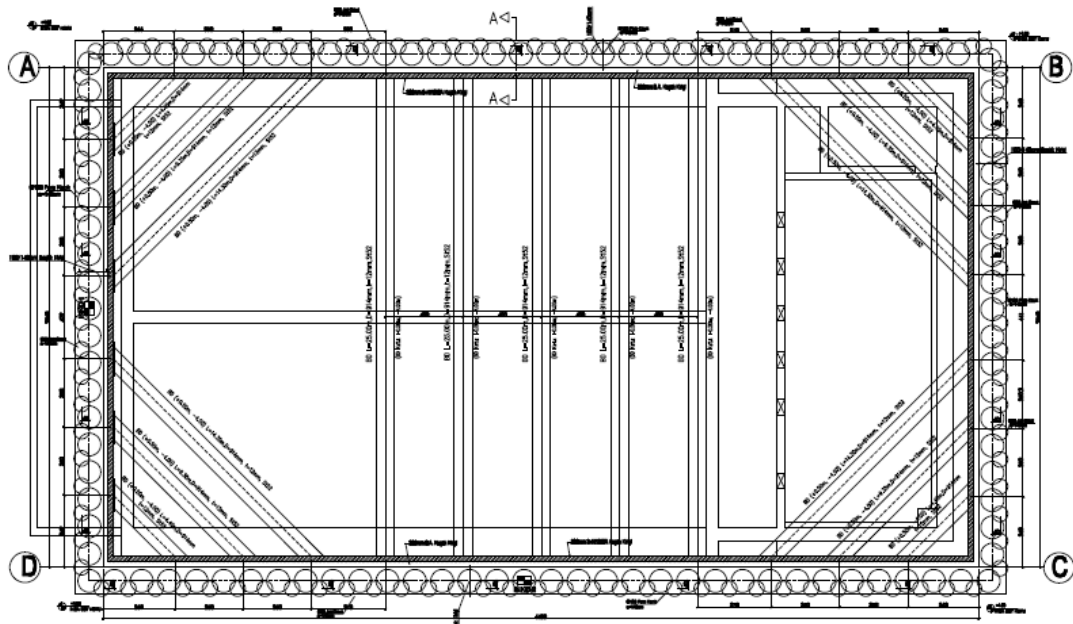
Plan of the Retaining System (ENAR, 2009b).
